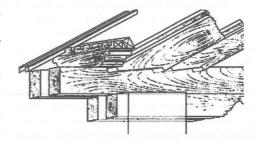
S. Paolo f. l. m., transept: details of the roof-trusses. Letarouilly1874, Plate 336 (Details)
